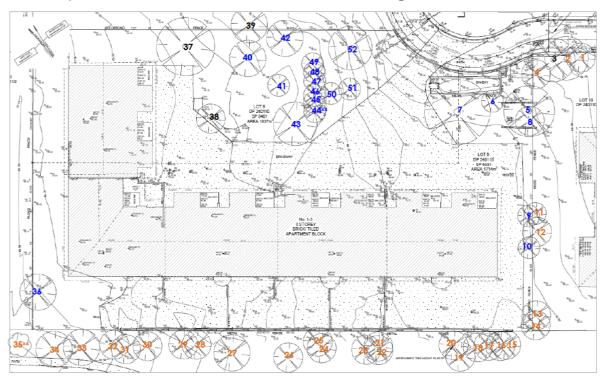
Extract from the Arboricultural Impact Assessment showing the existing trees on the site and providing the following recommendations:
